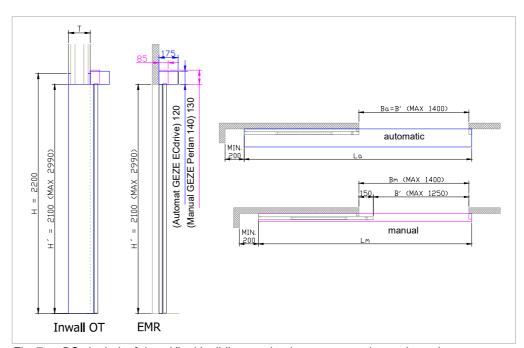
DS single-leaf door (J) with sliding mechanism, cross section and top view
